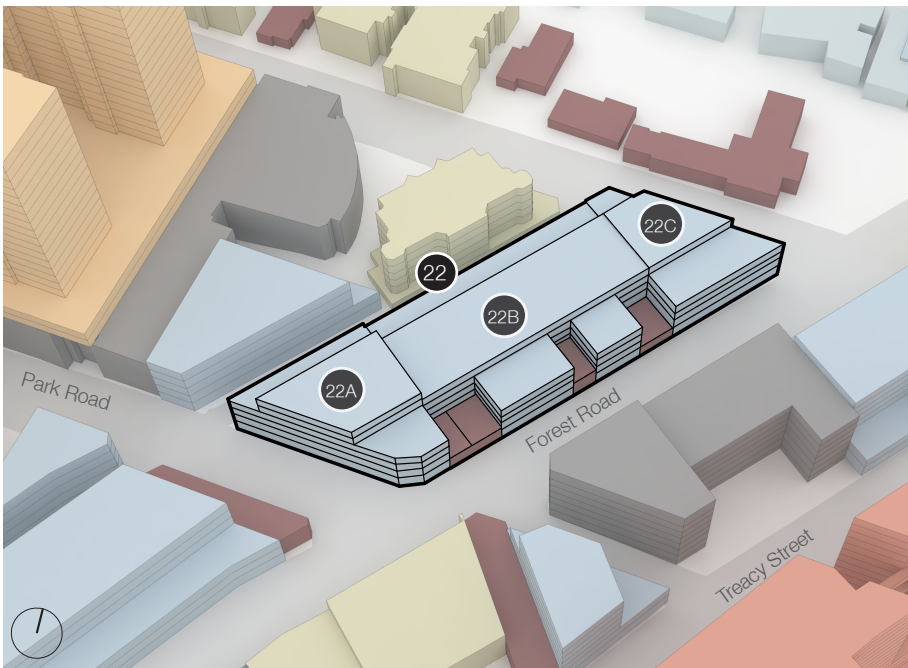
Cluster 01 4 Storey Street Wall Testing - Existing Controls
